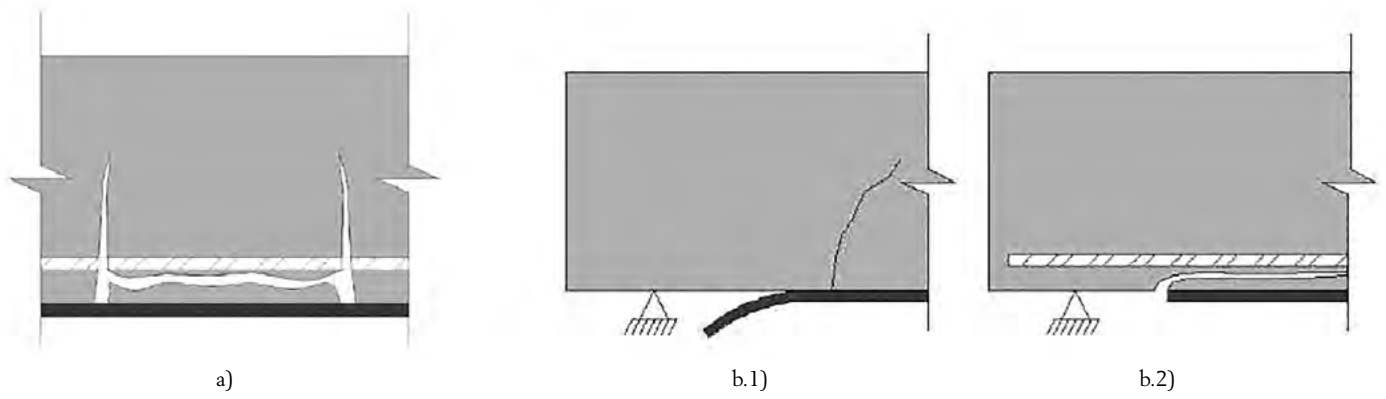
a) Intermediate crack debonding; b.1) laminate end debonding at the interface; b.2) laminate end debonding with concrete ripping-off.
